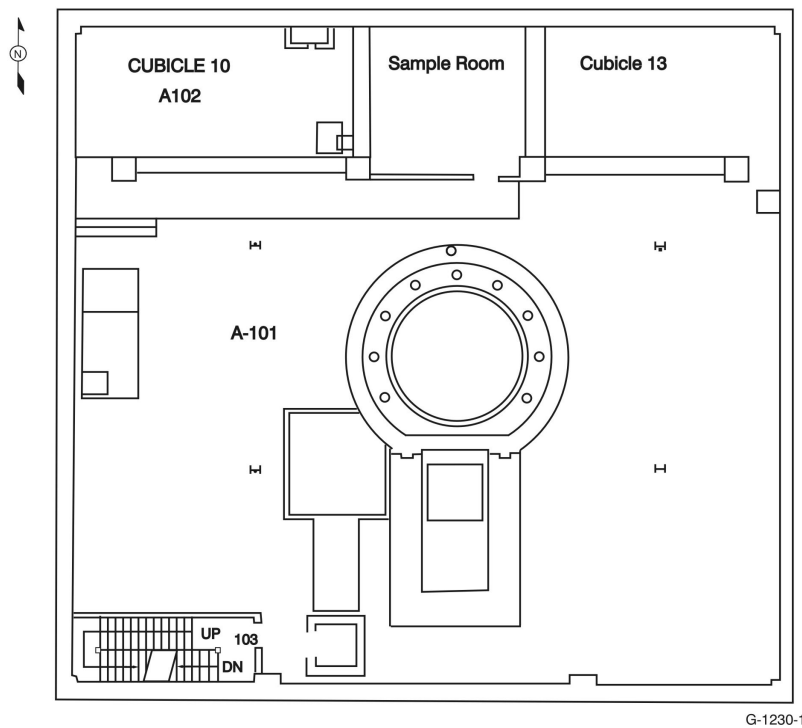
Power Burst Facility reactor building (PER-620) first basement showing Cubicles 10 and 13.
